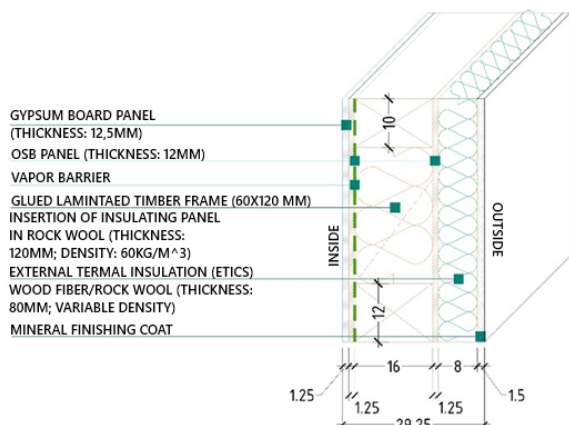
Typical stratigraphy of the prefabricated wooden wall.
